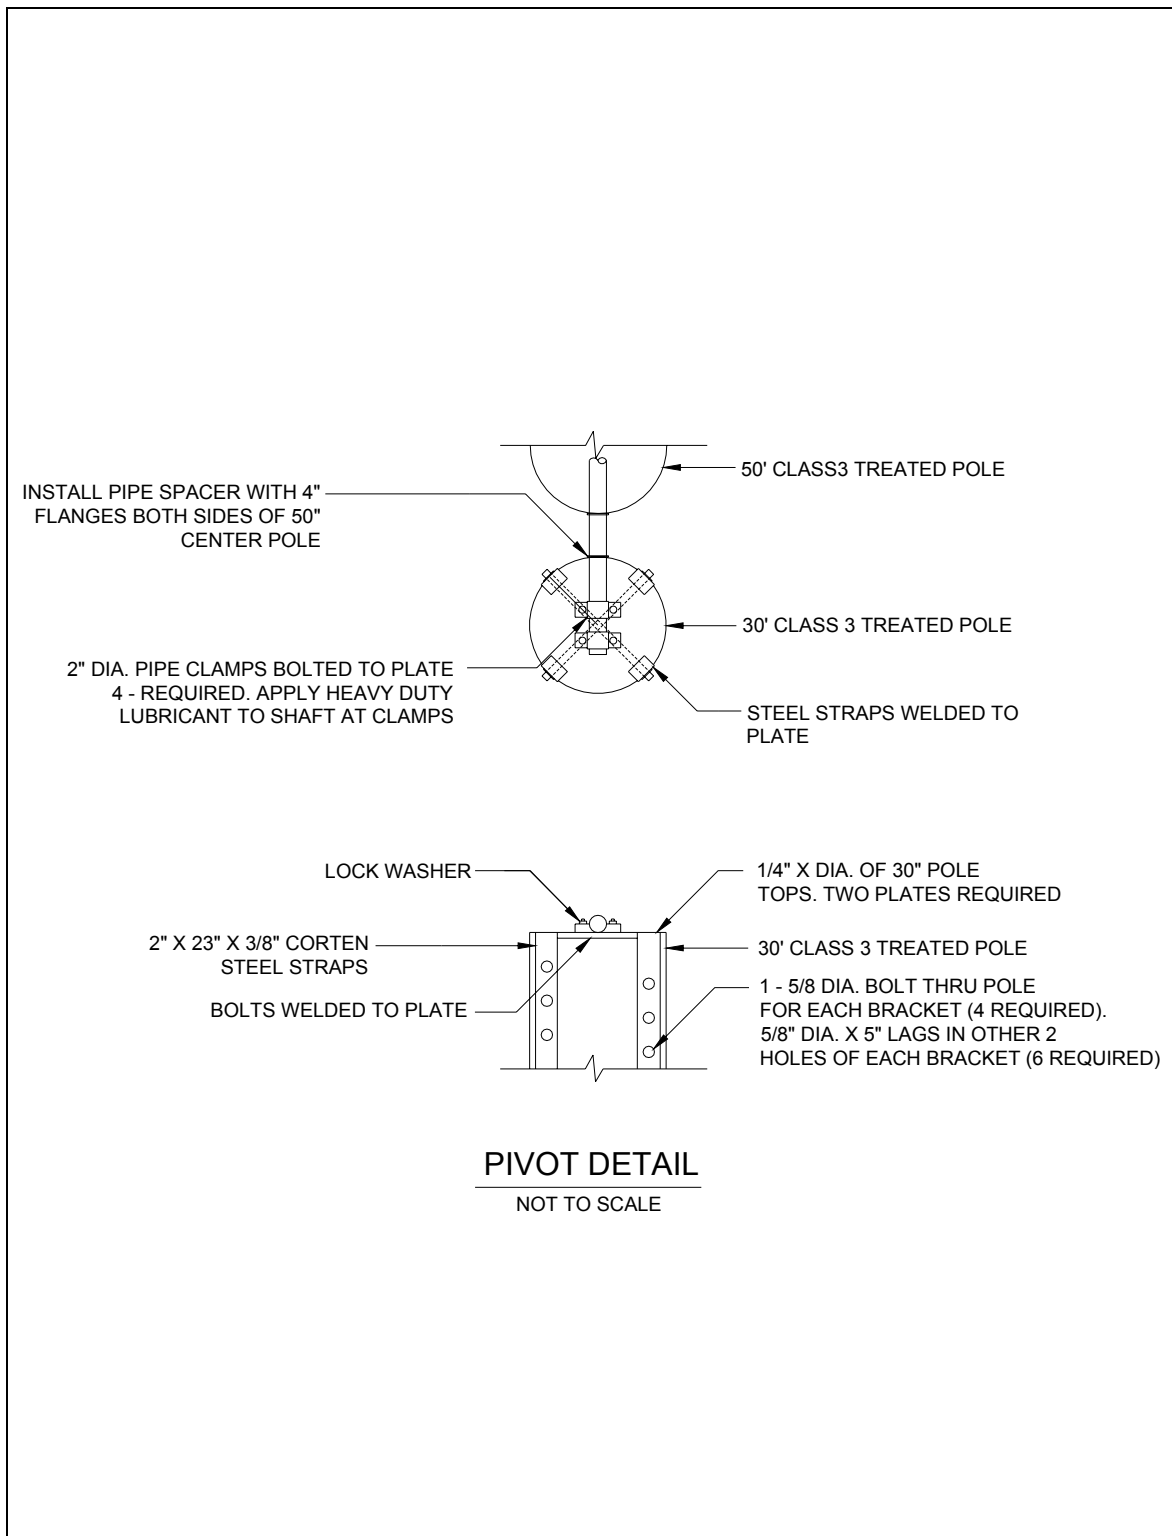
Standard Details for Pivoting Rotating Beacon Pole – GL-600 Sheet 4C – Pivot Detail
